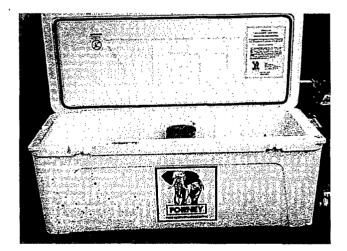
due to inclement weather, cylinders were placed in cure boxes
